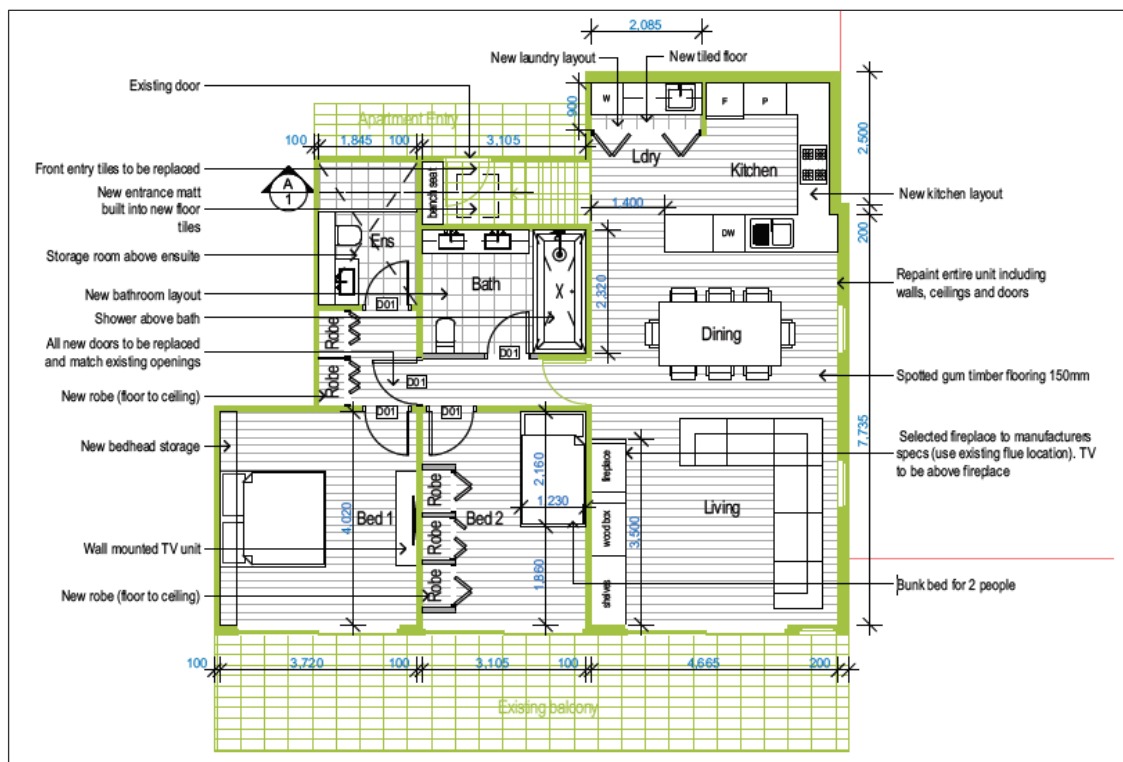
| Approved internal works (Source: Applicant's approved documentation)
